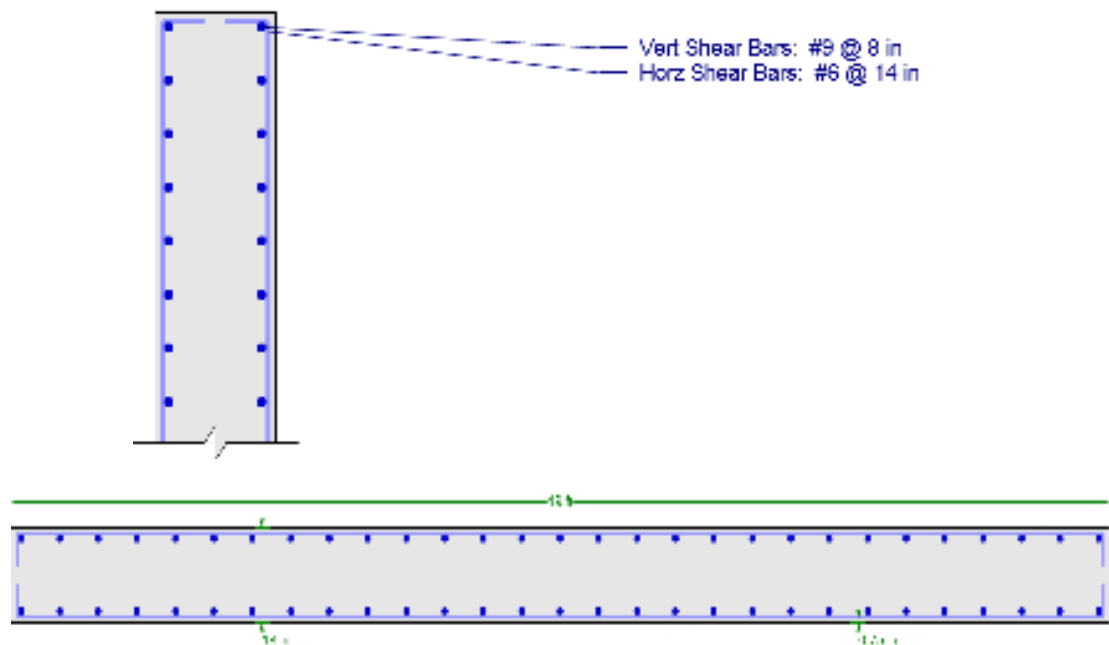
Building (B5-9S-H-S) Special RC Shear Reinforcement Details; Wall Section for Floors 4-6
